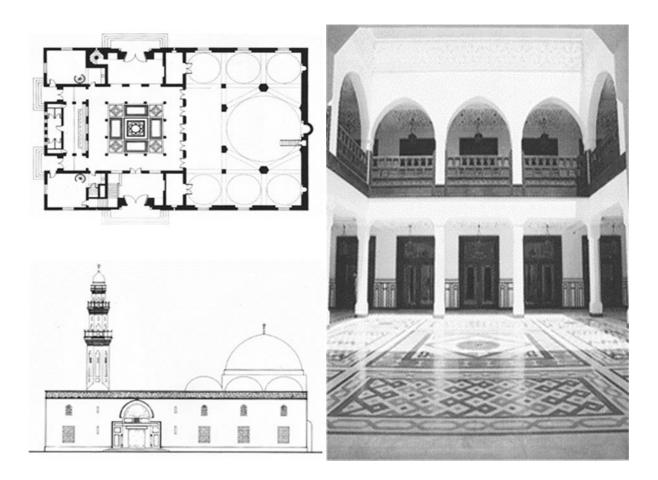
The Suliaman mosque's ground floor plan, elevation and the inner courtyard.
